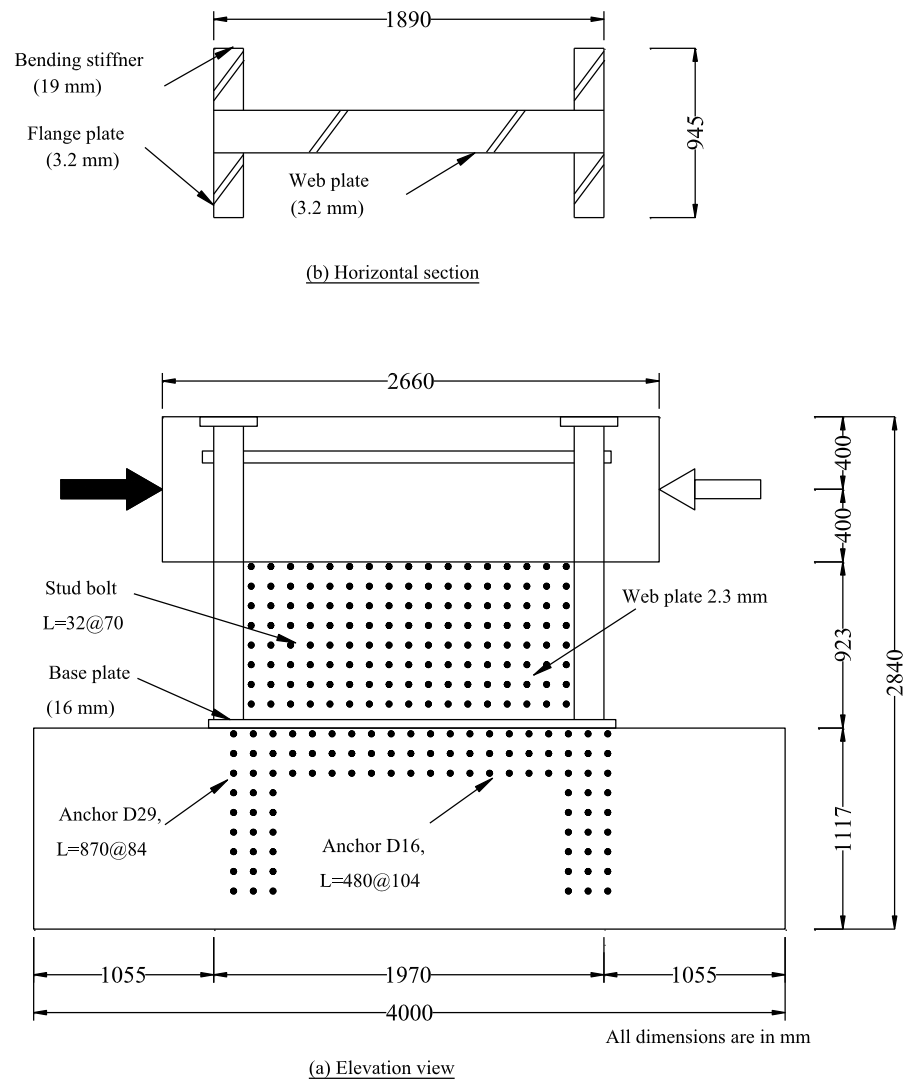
Steel-concrete-steel structural walls tested by Tsuda *et al.* (2001)
